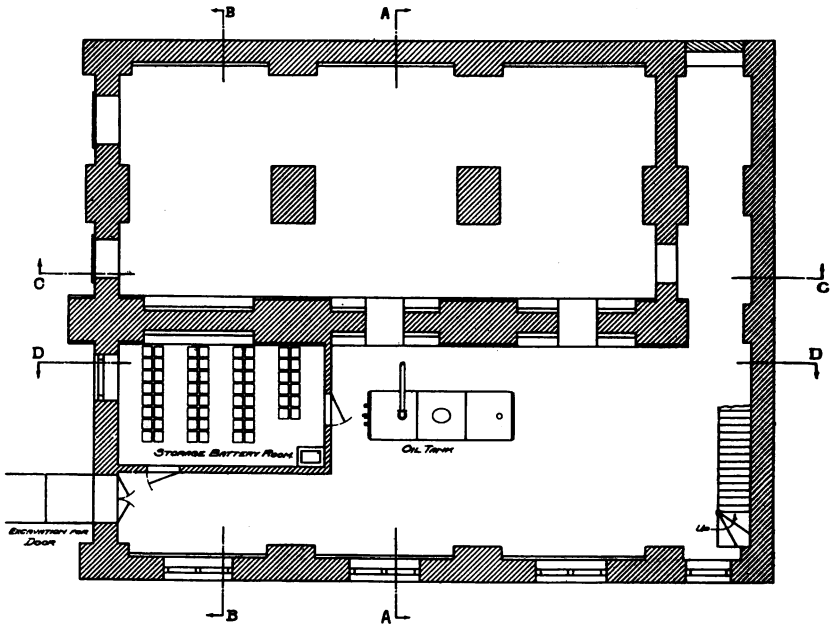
Basement Floor Plan, Substation, Chattanooga & Tennessee River Power Co.
